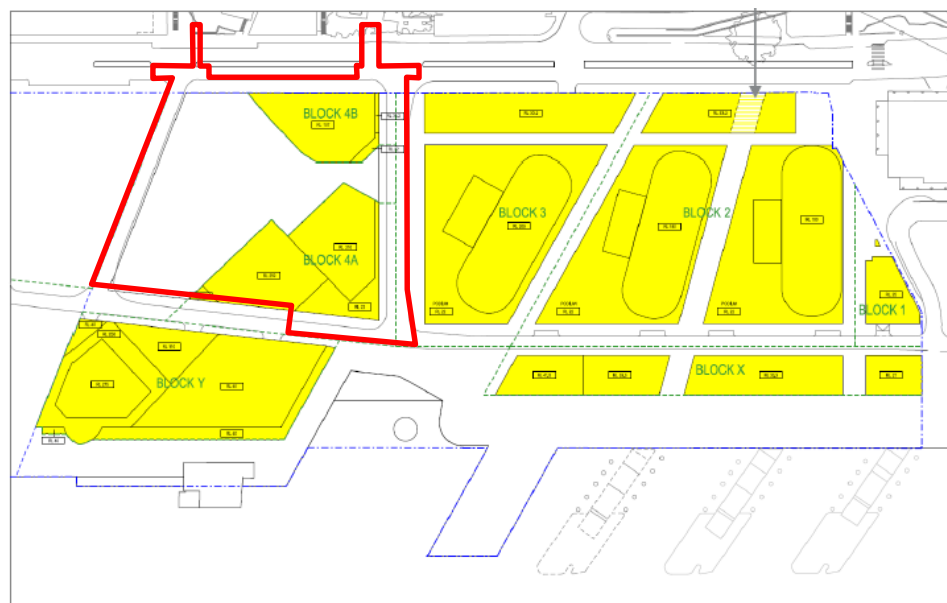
Stage 1B Basement (red outline) in relation to the proposed Concept Plan (Mod 8) Indicative Building Layout
